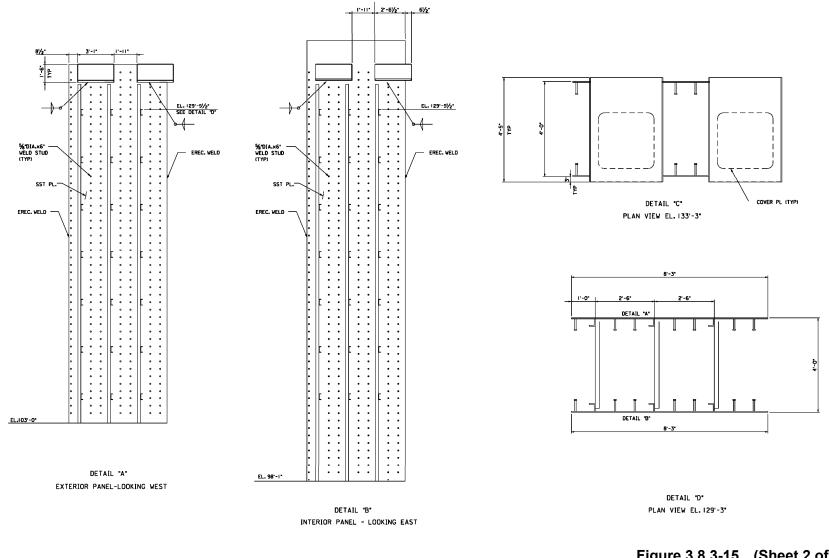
(Sheet 2 of 2) [Typical Submodule]\
